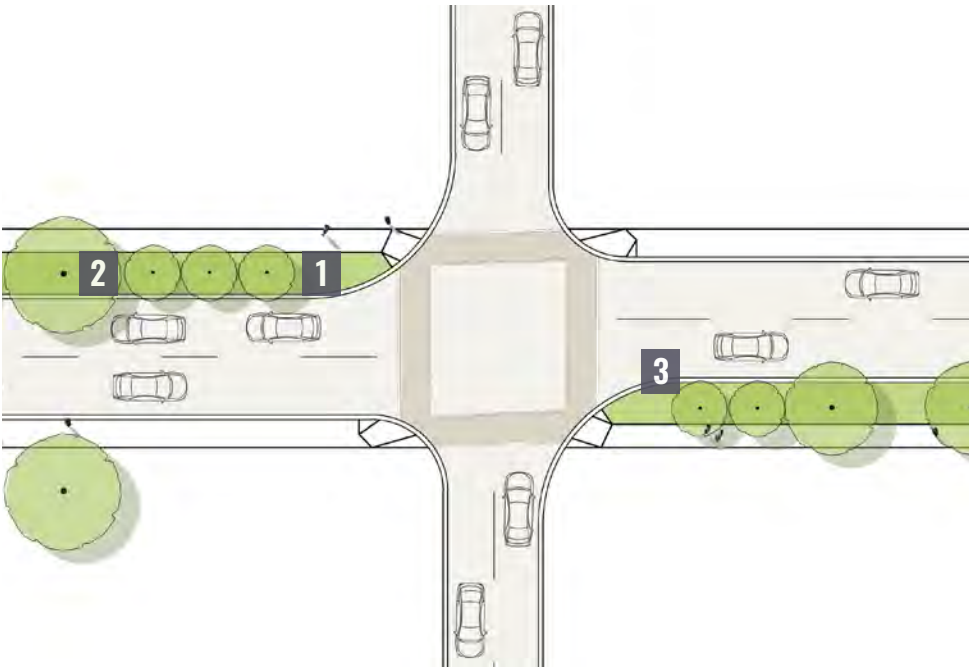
PLAN VIEW OF GREEN STREET RETROFITS ALONG DECATUR STREET
